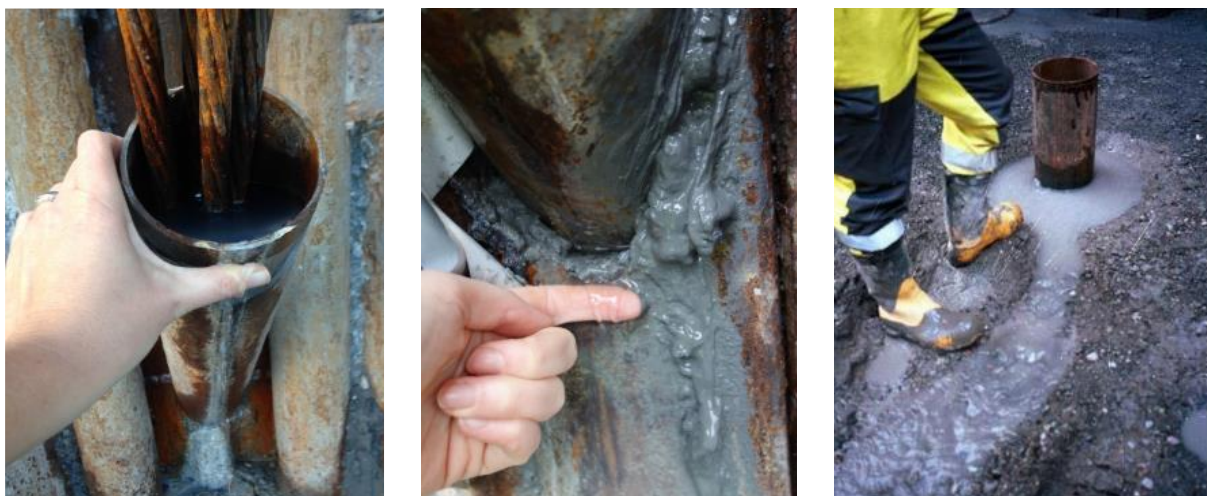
Typical leakages in connection with installing tie-back anchors and steel core piles [2]
